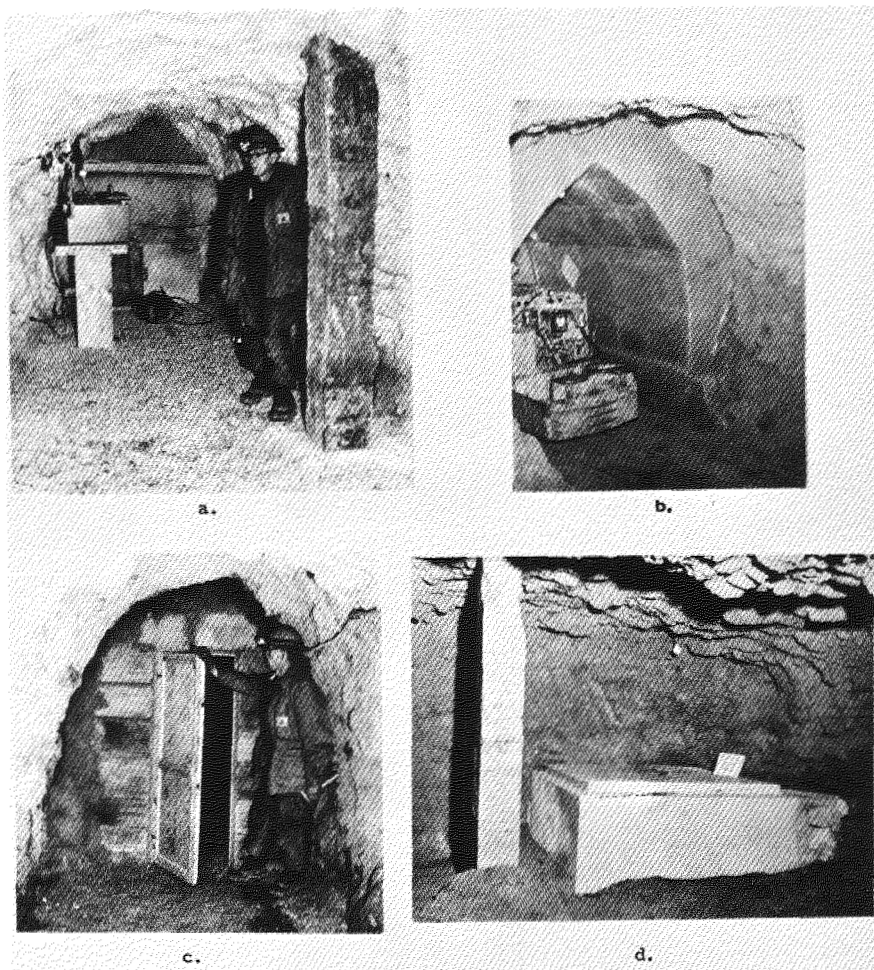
Application of artificial frozen soil mixtures: a. Column supporting a loose roof slab; b. tunnel section protected by a combination of poured permacrete and precast bricks; c. bulkhead made of large precast bricks; d. diesel fuel storage pit poured in place and lined with fine grain frozen material. Finish: Clay slurry applied with paint brush
